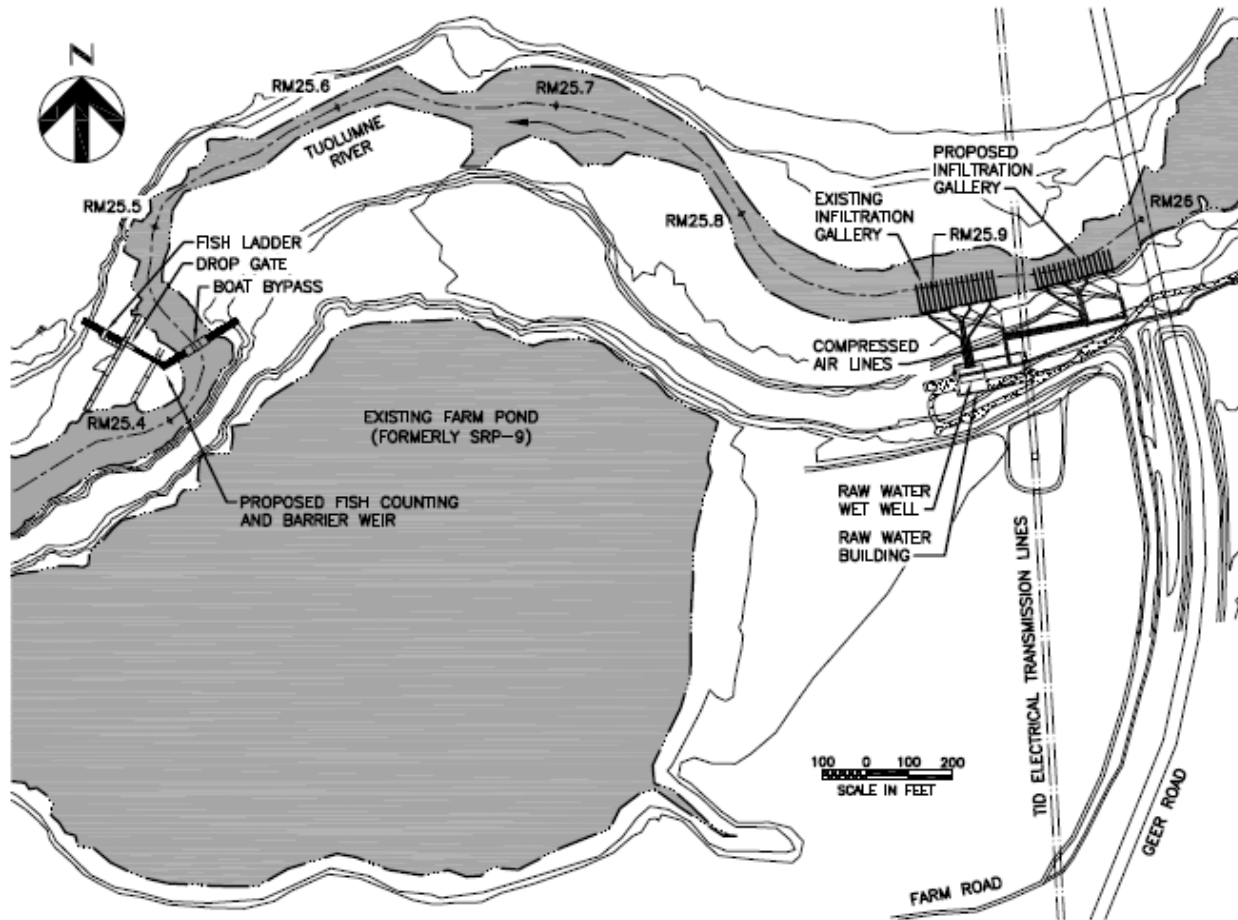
Proposed location of IG-2 upstream of the existing IG-1. Geer Road is located at RM 26 and the proposed fish counting and barrier is located at RM 25.5.
